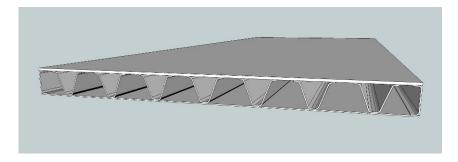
Trial Steel Sandwich Panel Bridge Deck
